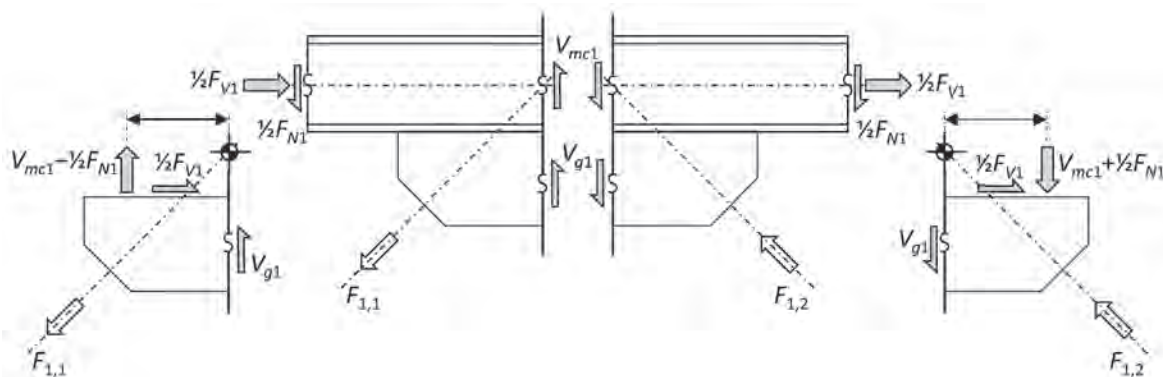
Transverse section of beam and gusset showing chevron shear.
